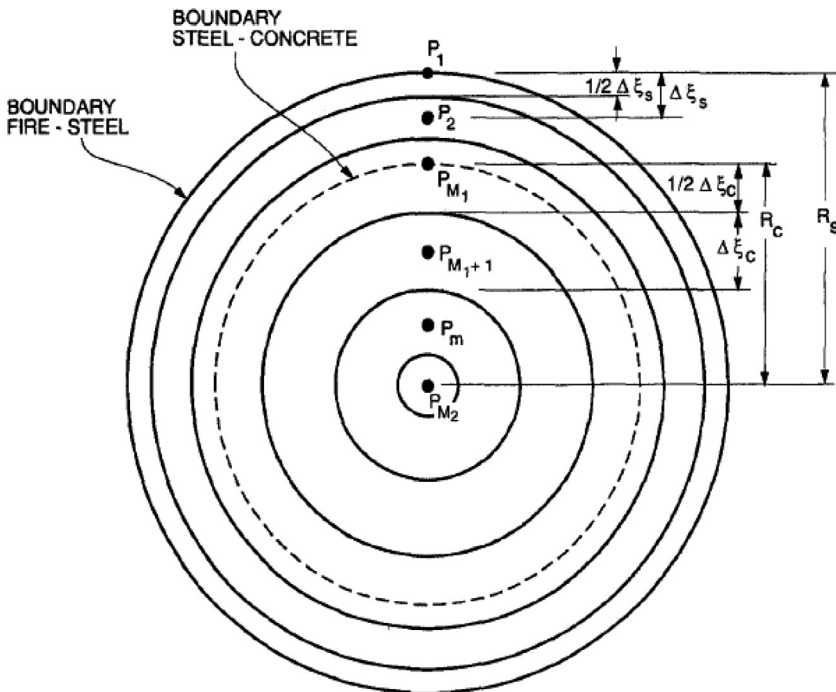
Arrangement of layers in section of concrete-filled steel column.
